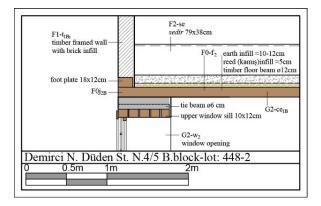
Connection detail 2, section drawing of floor beams located over the masonry wall along the wall thickness and timber framed wall built on the foot plate (Demirci N. b.block-lot:448-2)
